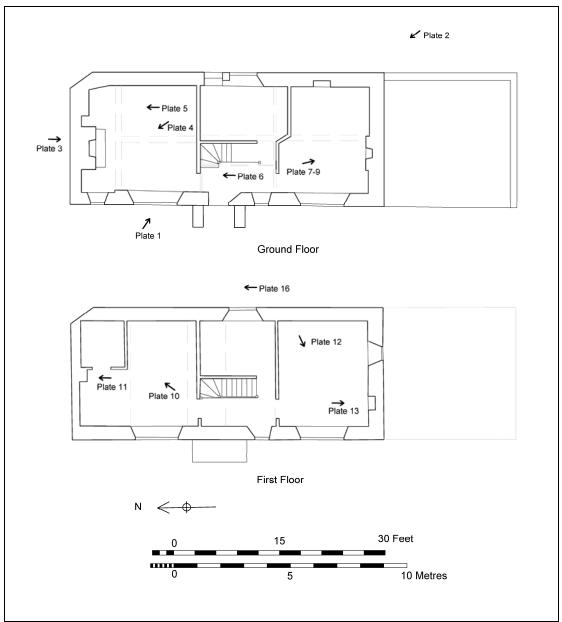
Chestnut Cottage Floor plans with location of Plates 1-13 added (derived from plans supplied by FWK Architects).
